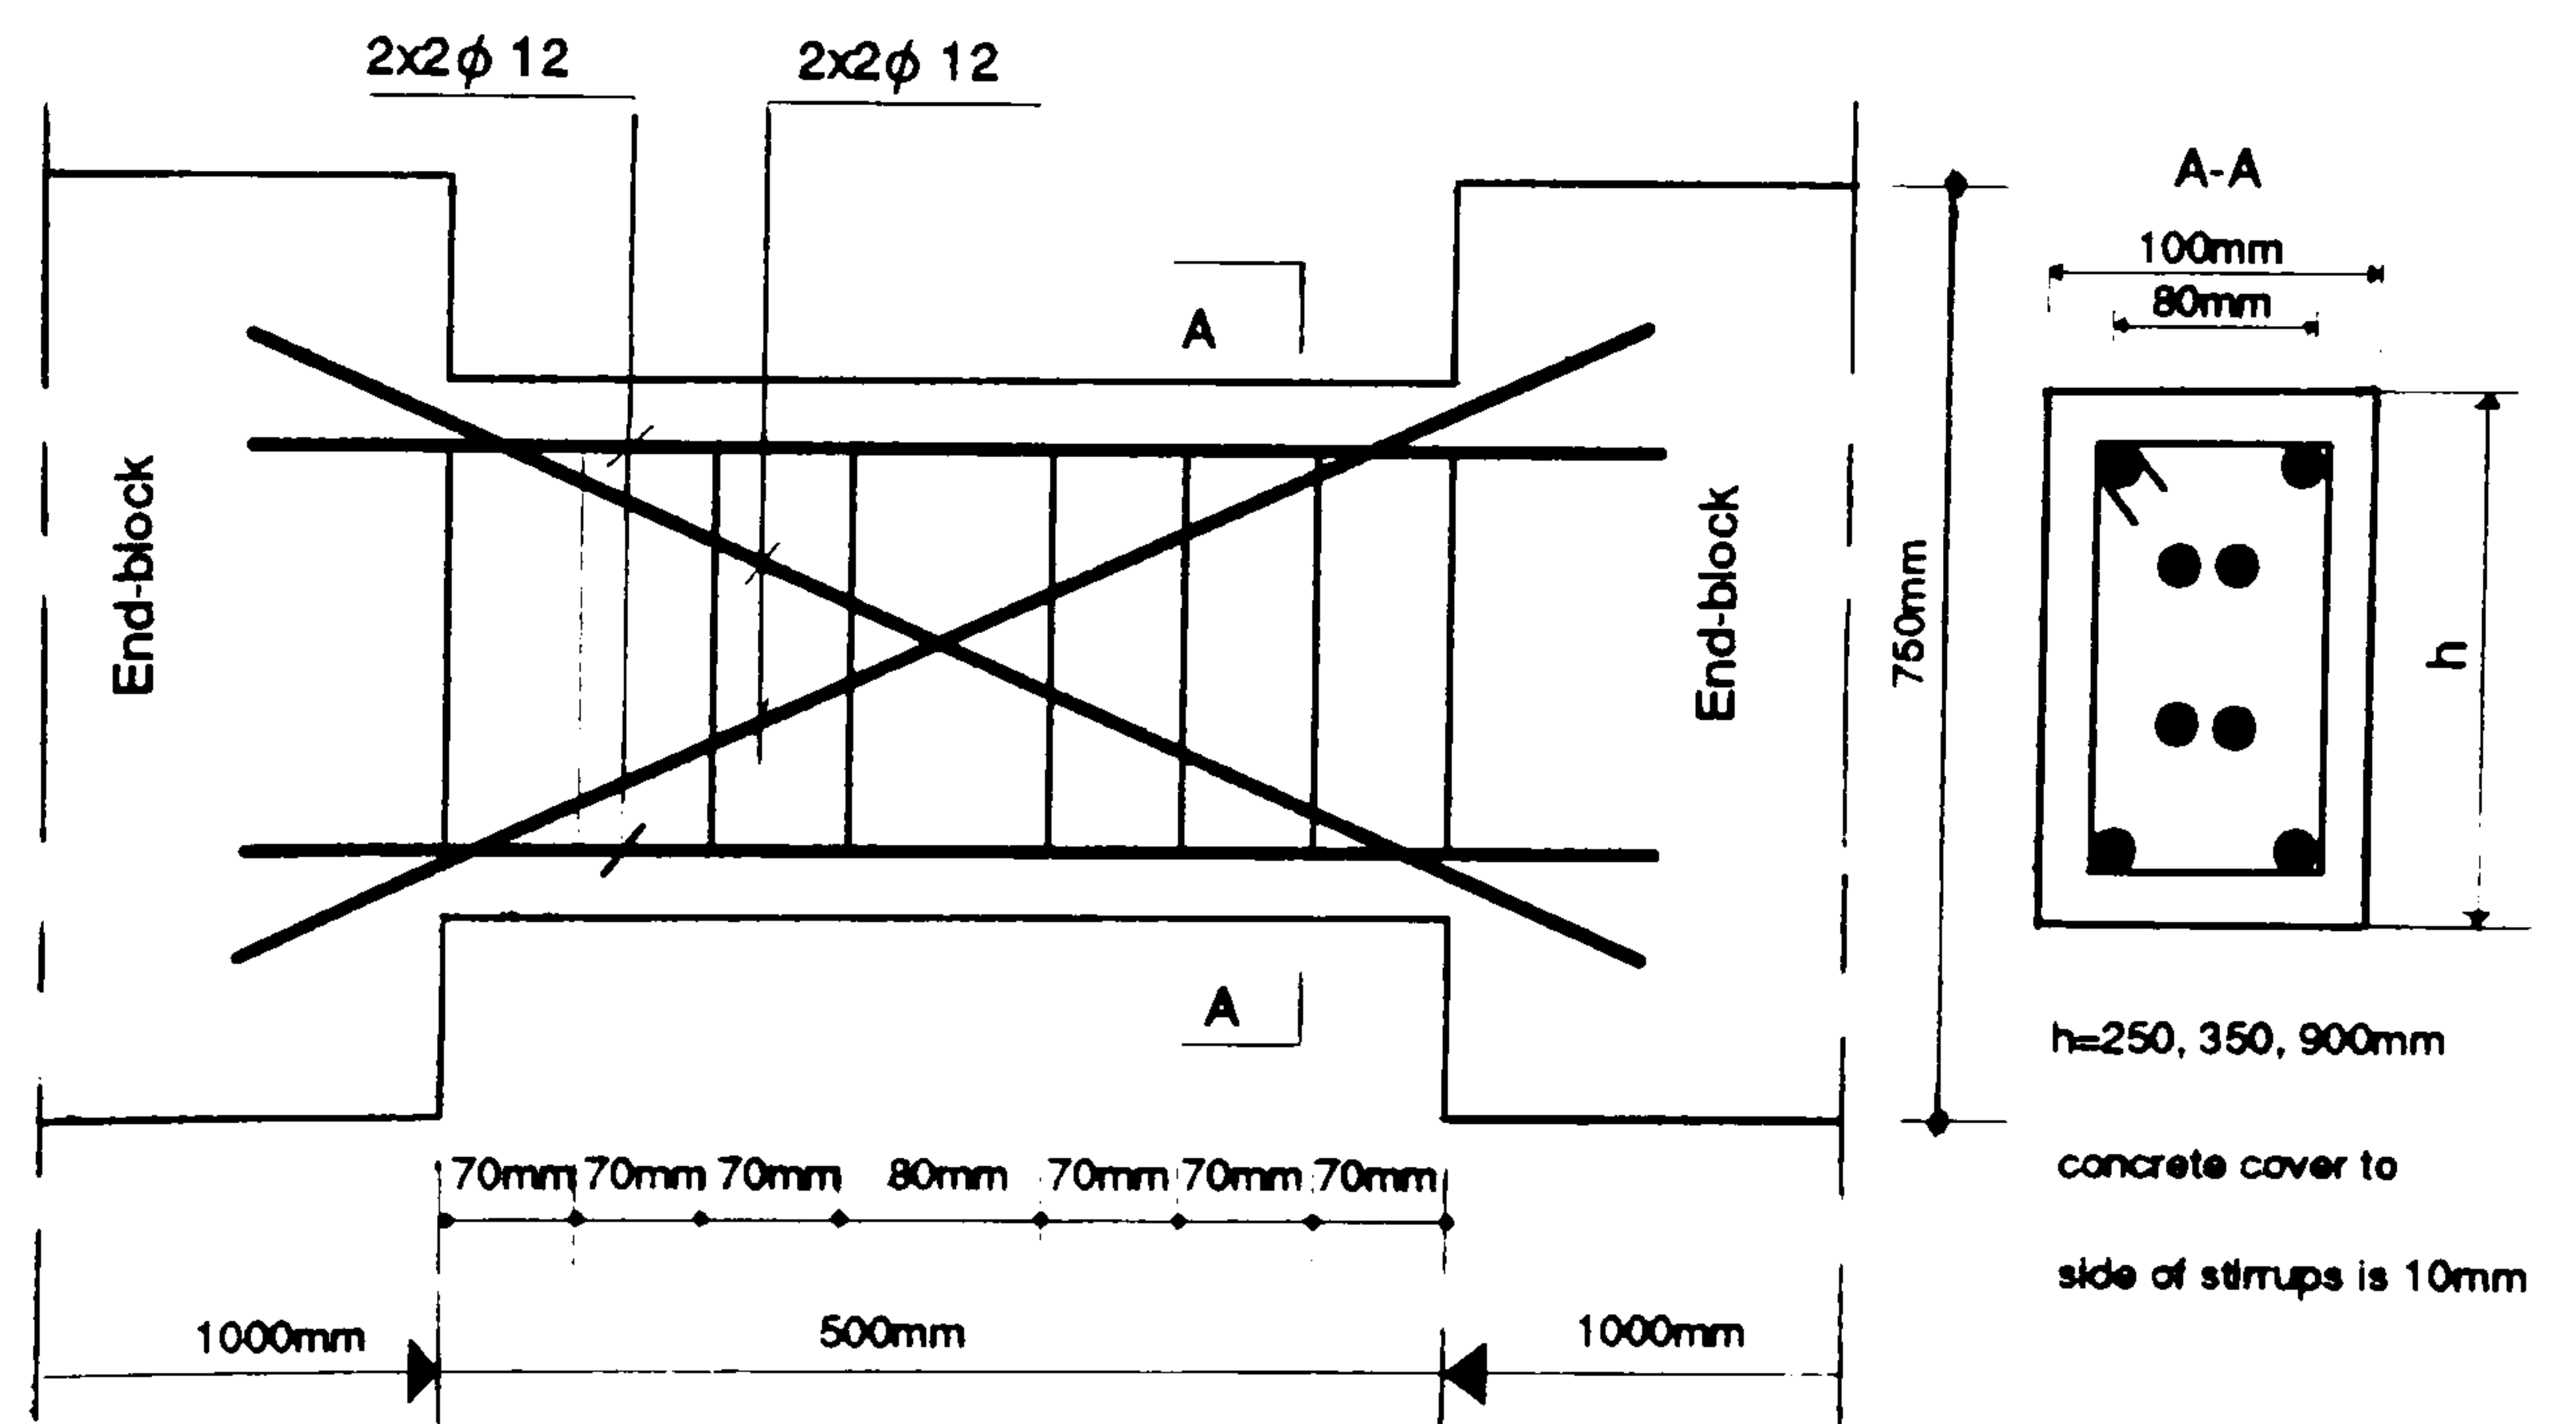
Dimensions of the coupling beam reinforced with stirrups and diagonal bars
